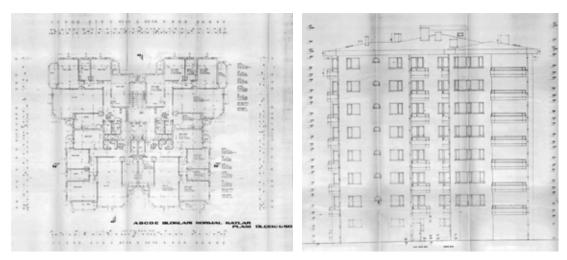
Typical Floor Plan and East Elevation of the Building
